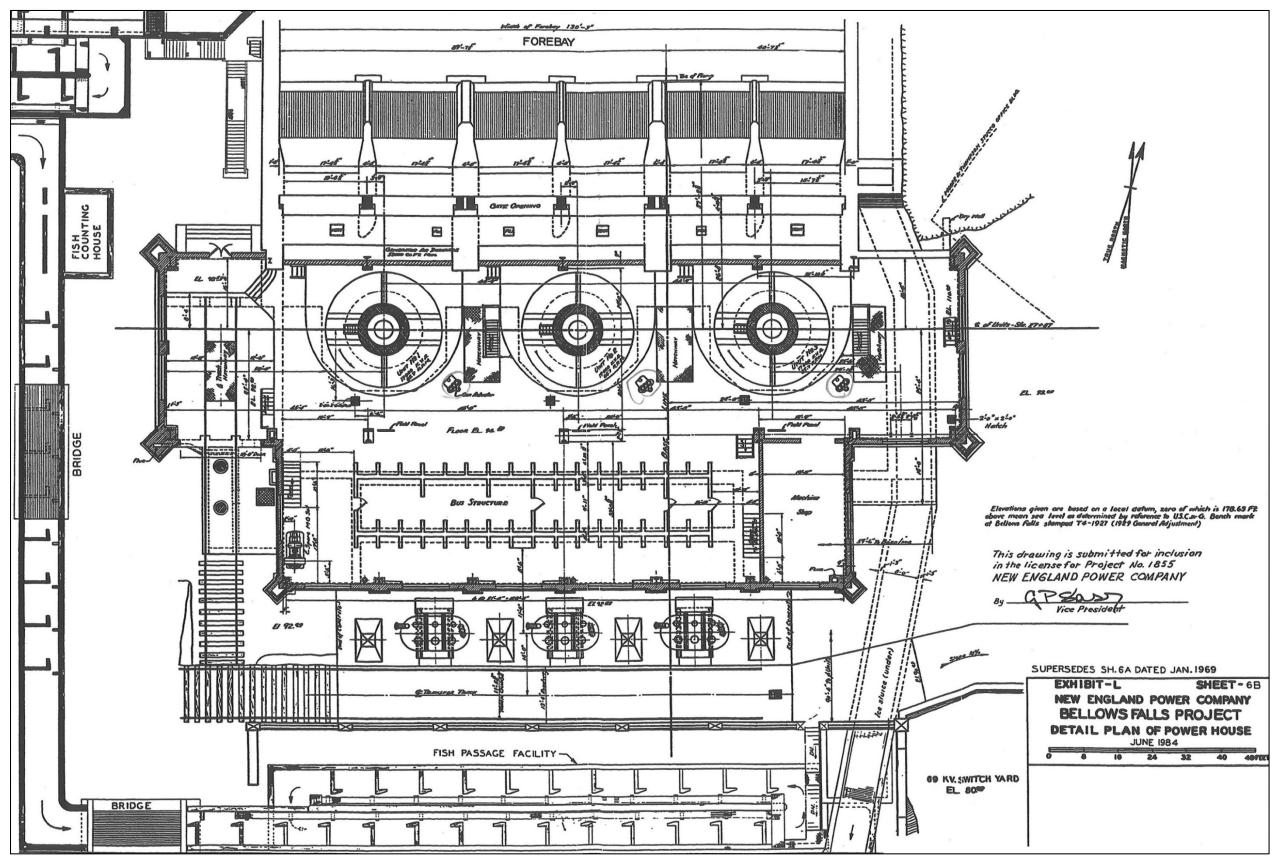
Plan of the Bellows Fall Project Powerhouse and Fish Ladder.
